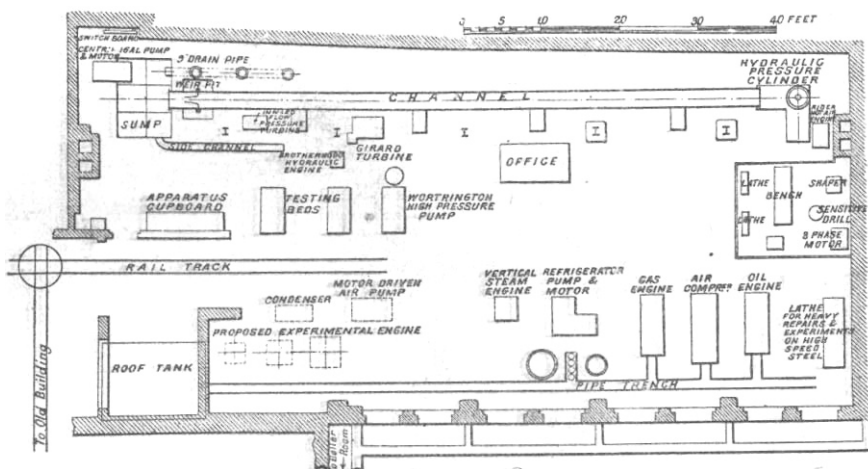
Plan of the Engineering Laboratory the City and Guilds Technical College, Finsbury.
